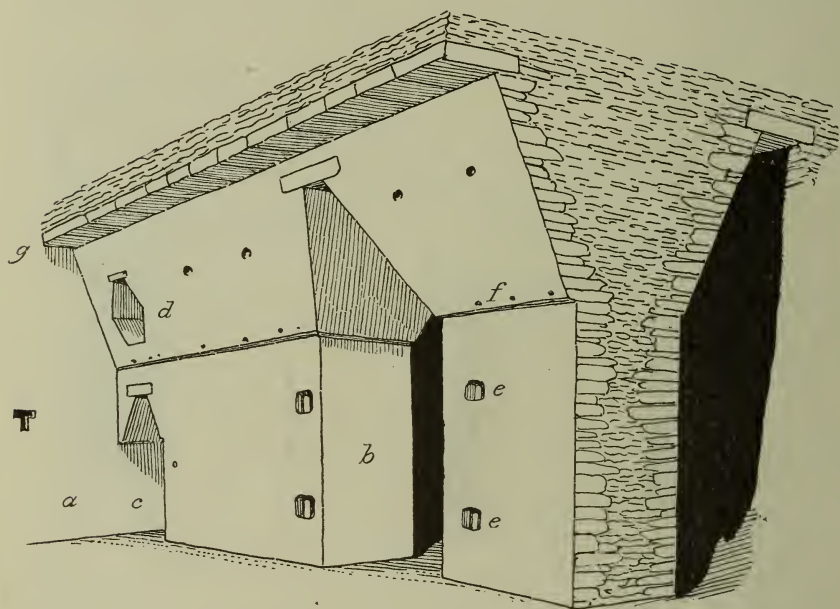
INTERIOR DOORWAYS (THROUGH MEDIAL WALL) WITH SECTION OF MEDIAL WALL AND CEILING.
